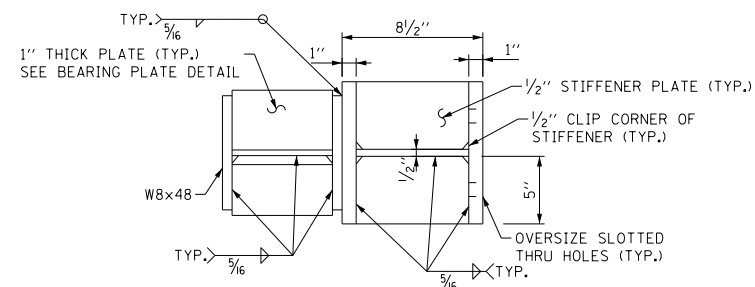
NOISE BLOCKING ASSEMBLY
